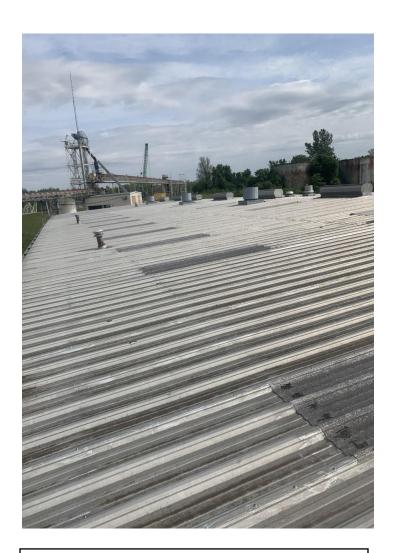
Photo showing fiberglass skylight arrangement and roof of the building where the incident occurred (photo taken prior to incident).
